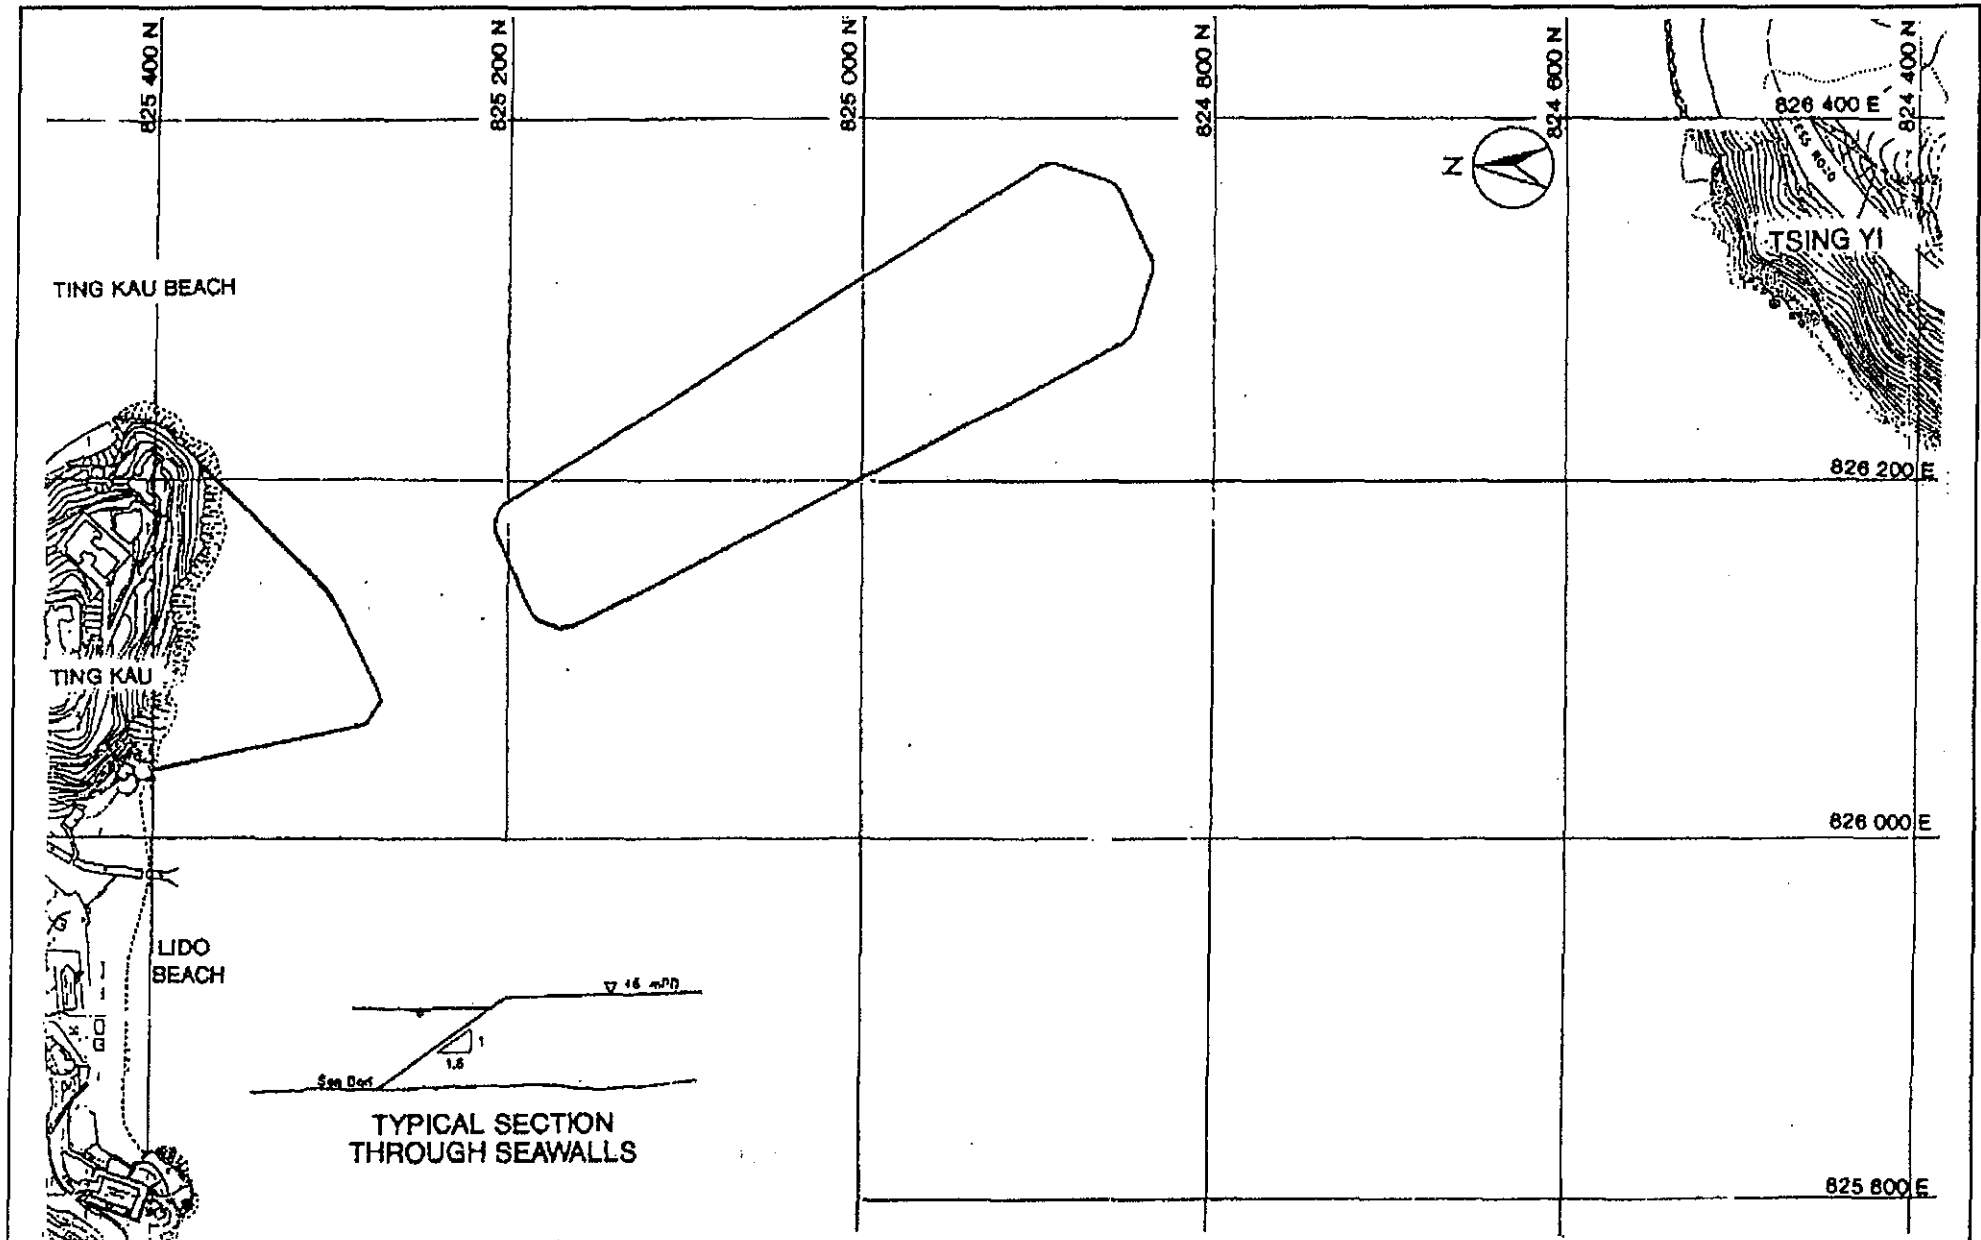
Layout of Causeway for Water Quality Modelling of a Ting Kau Bridge Proposal
